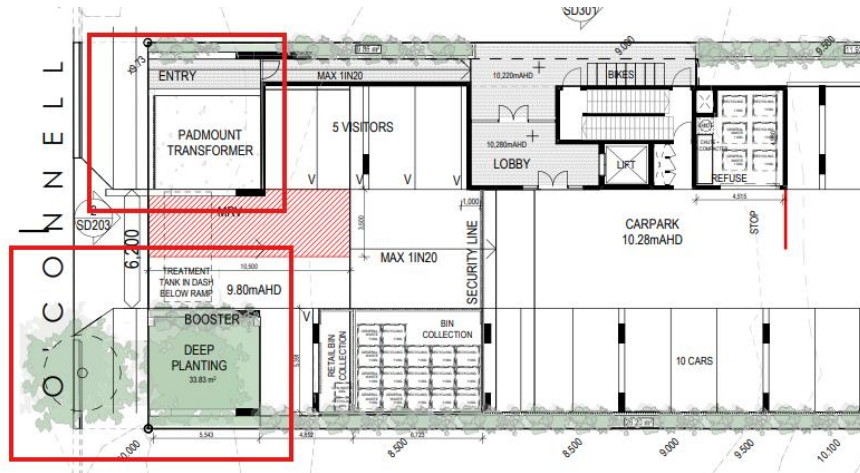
Revised PMT Location - O'Connell Street (Source: DAH Architecture, 2026)
